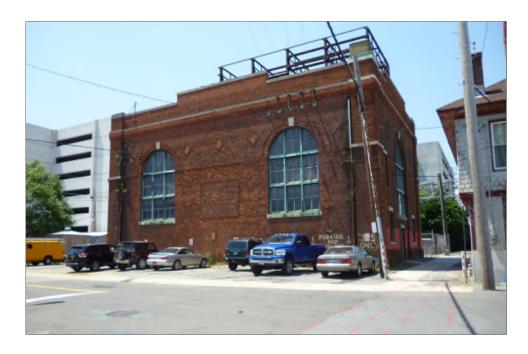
Former Mineola Substation building in southwest quadrant of Main Street, Mineola grade crossing – a potential property taking, which will likely be demolished for surface parking improvements. Note the Nassau Tower structure at extreme right of photo.
